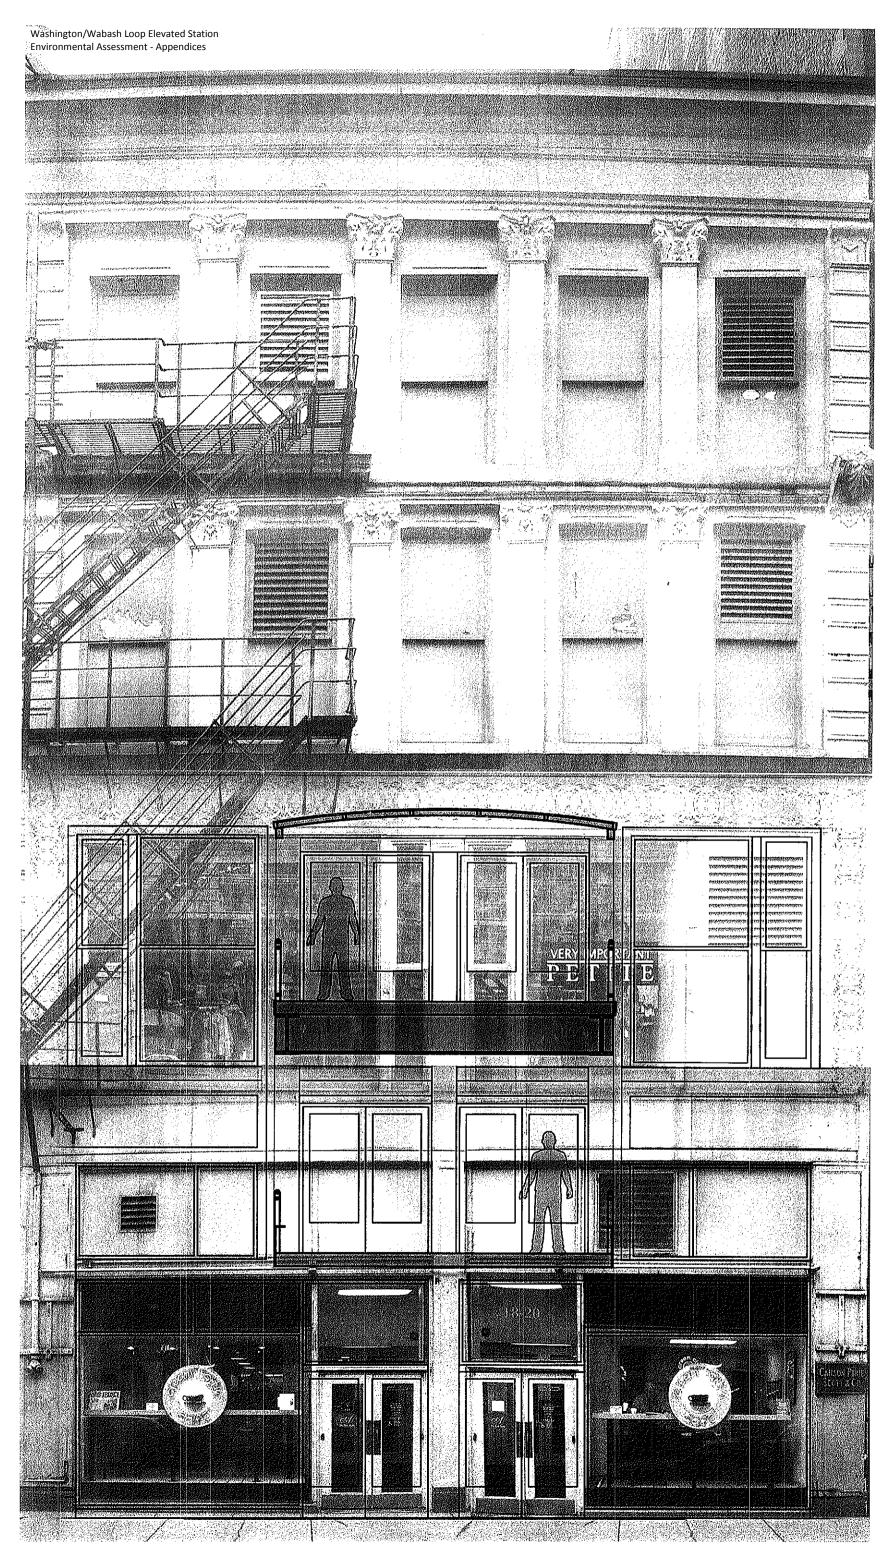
IMAGE DEPICTING POSITION OF PROPOSED BRIDGE CONNECTING THE STATION-HOUSE IN THE HASKELL - BARKER BUILDING TO THE LOOP ELEVATED STRUCTURE. 14
